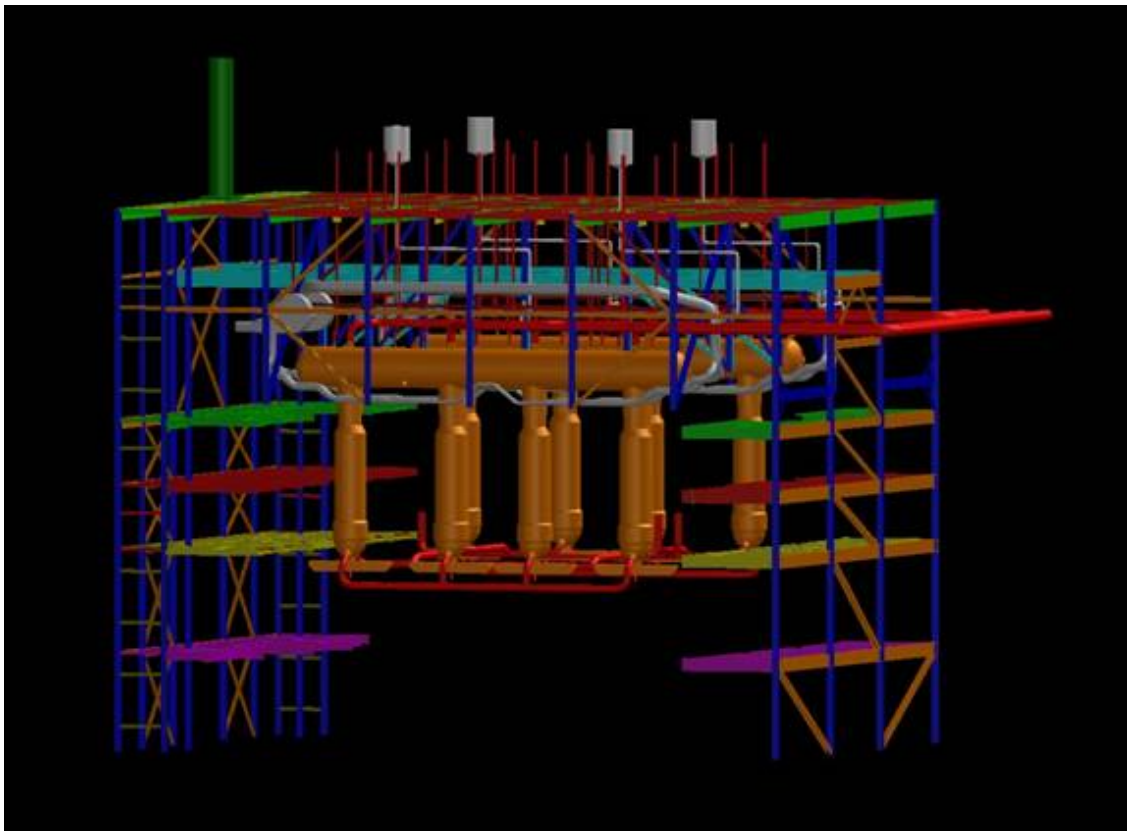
3D Model of the Steam Generators and Steam Drum Assembly
